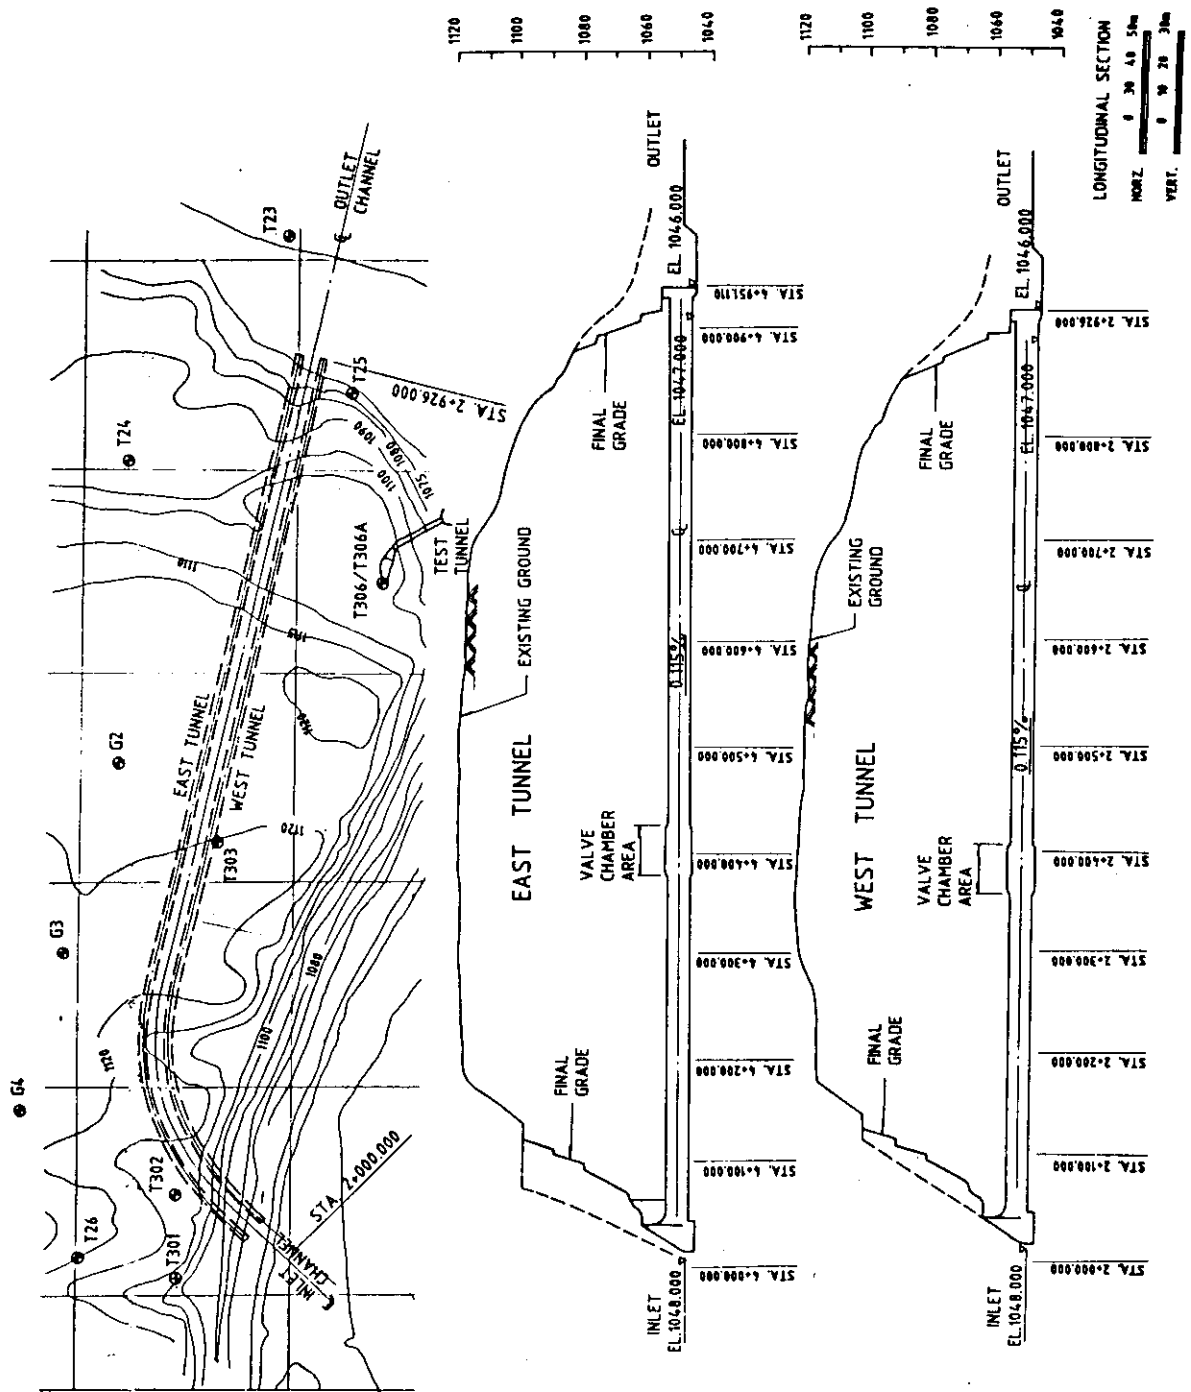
Diversion tunnels for Oldman River Dam, Canada ; layout plan and profile
